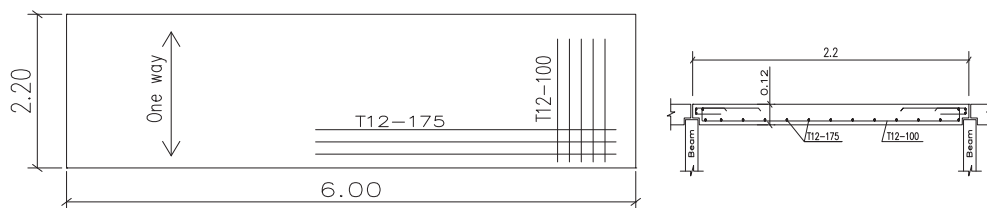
Plan and cross section details of the slab model, dimensions in meter.
